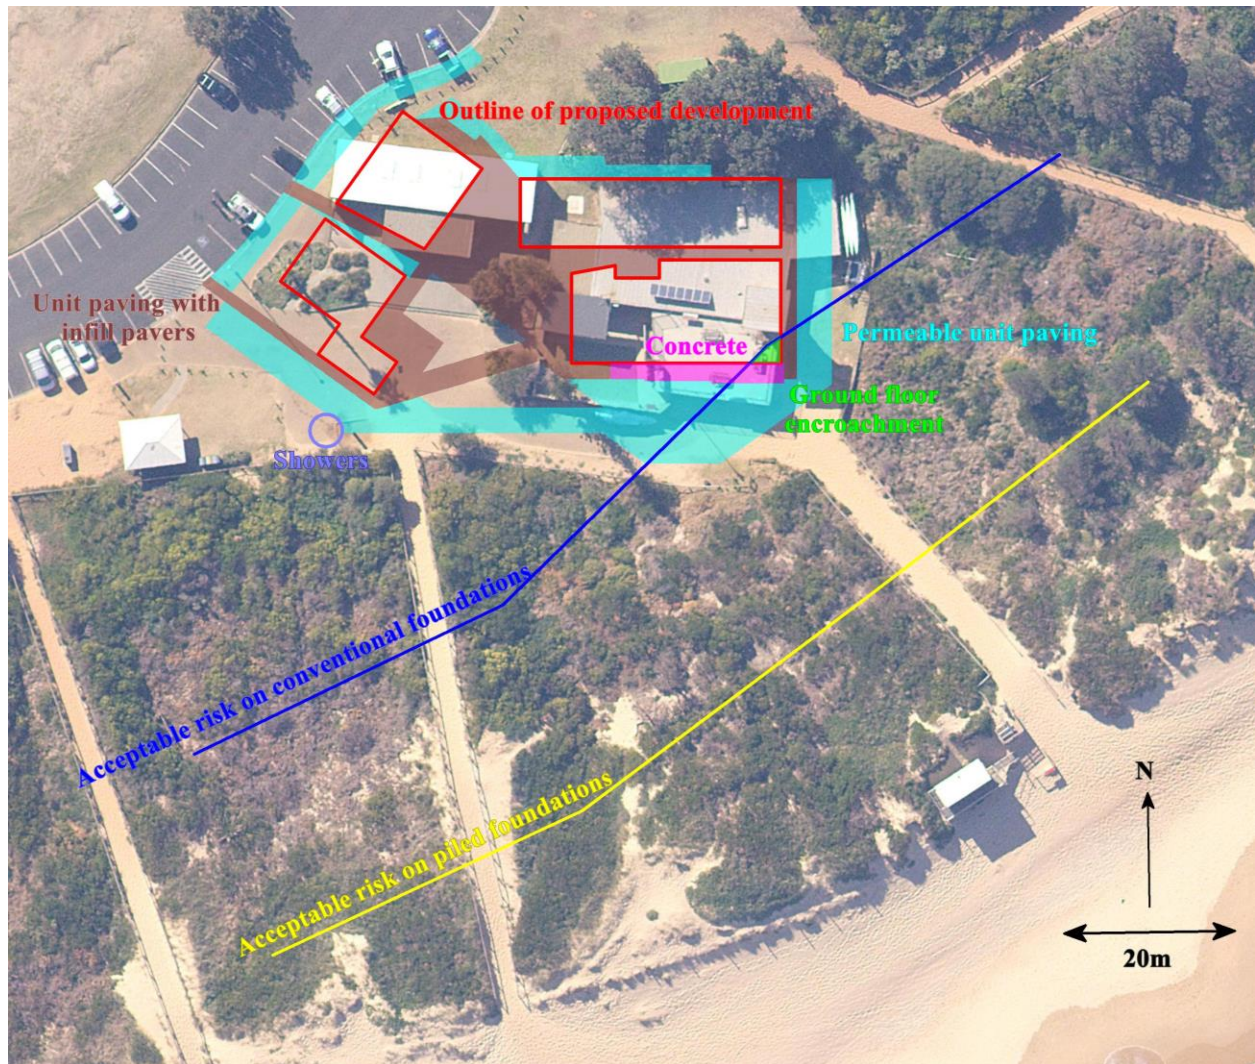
Acceptable risk lines for new development for a 100-year planning period at Long Reef SLSC, with outline of ground floor of proposed development and extent of ground floor encroachment seaward of the “acceptable risk on conventional foundations” line shown, and the extent of paving and concrete around the SLSC also shown (aerial photograph taken 17 August 2018)
